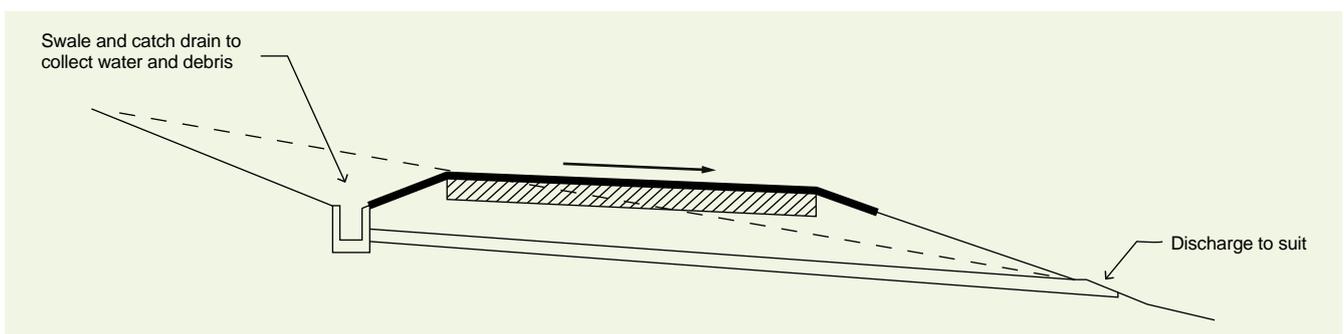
Drainage and crossfall requirements for path where existing terrain exceeds path crossfall – preferred (image courtesy of Austroads Guide to Road Design: Part 6A (Figure 5.14)).
